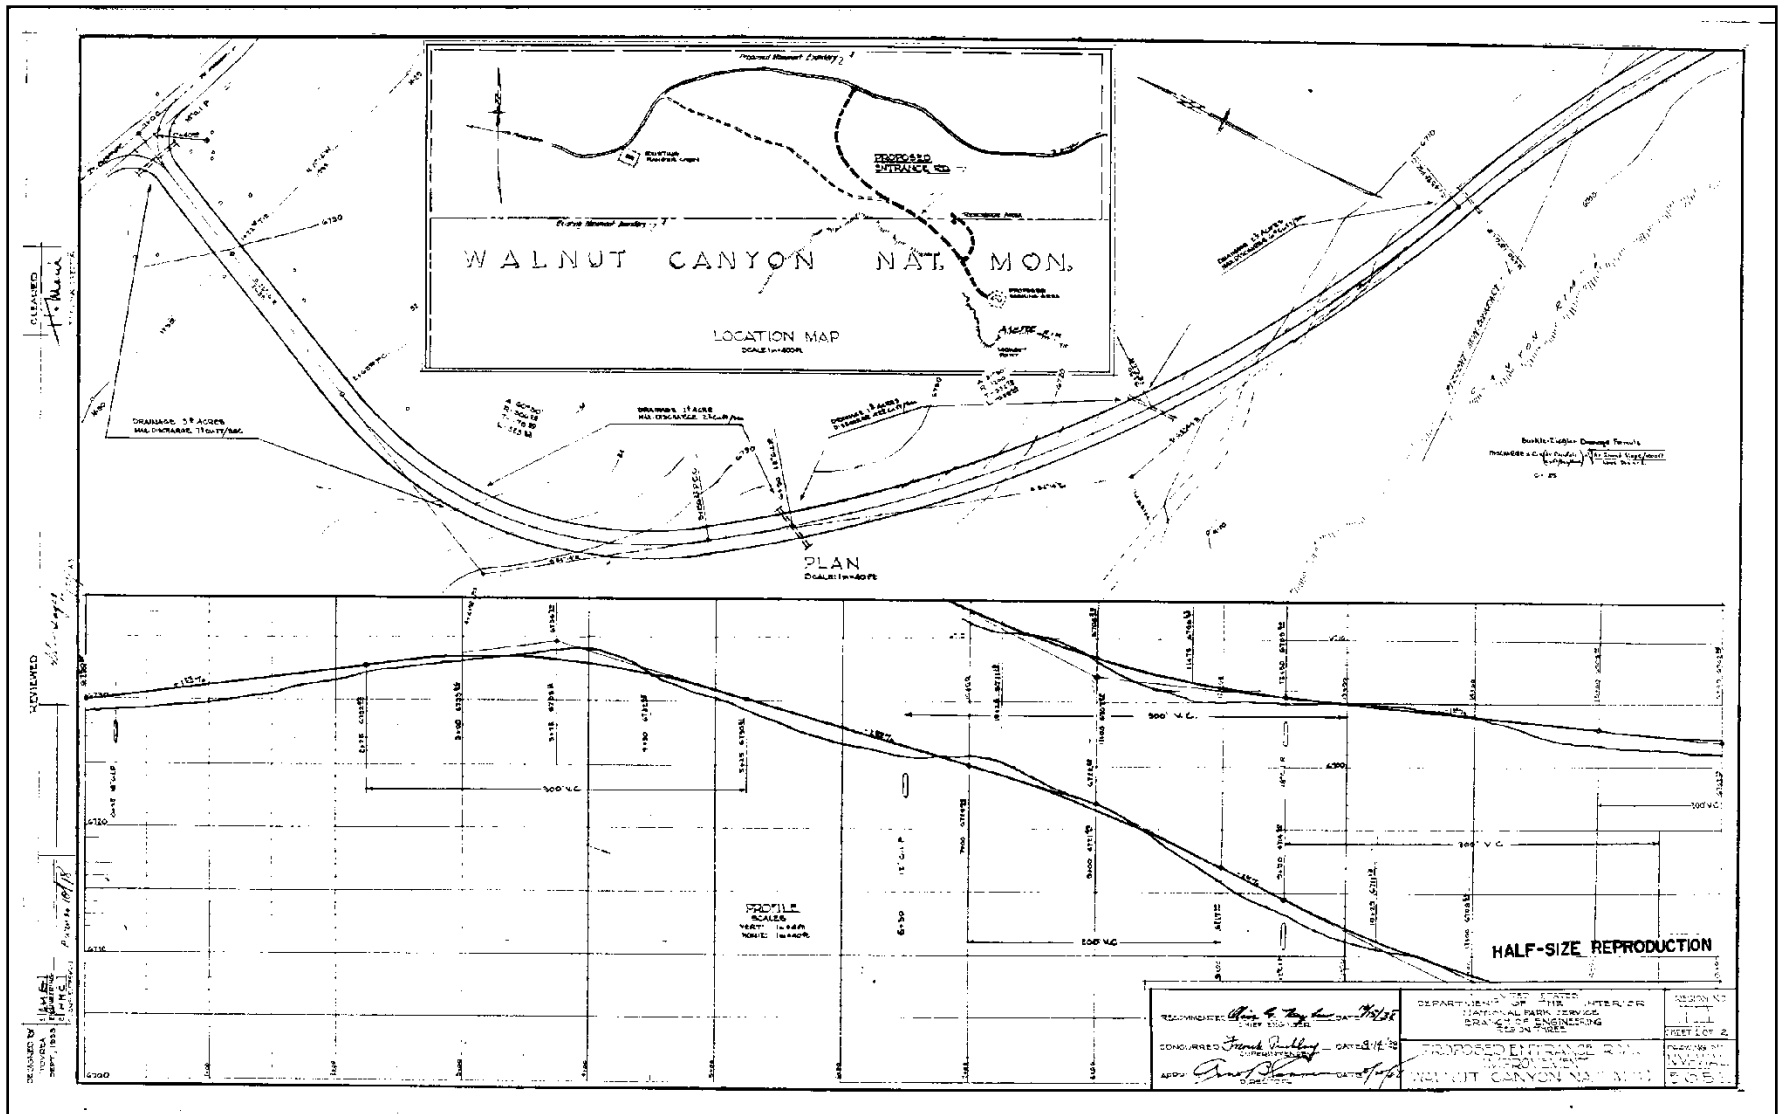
Plans for Proposed Entrance Road (NPS Dwg NM-WAL 5352, sheet 1), 1938.
